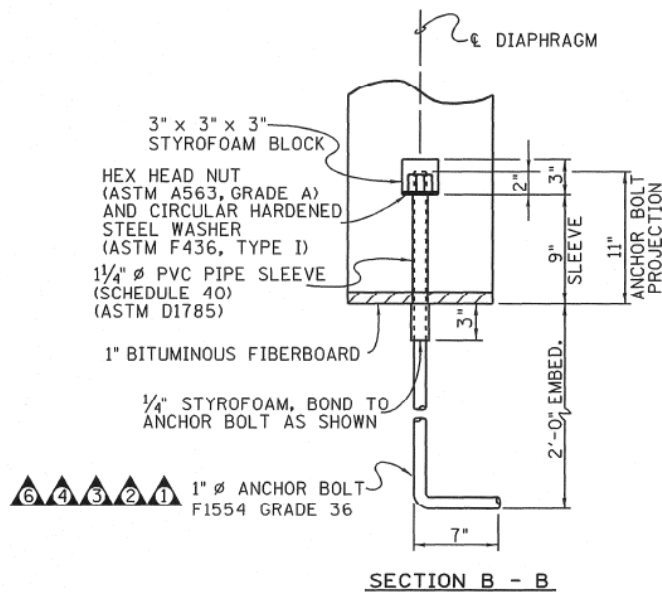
Tennessee DOT Longitudinal Connection (Section B-B)
